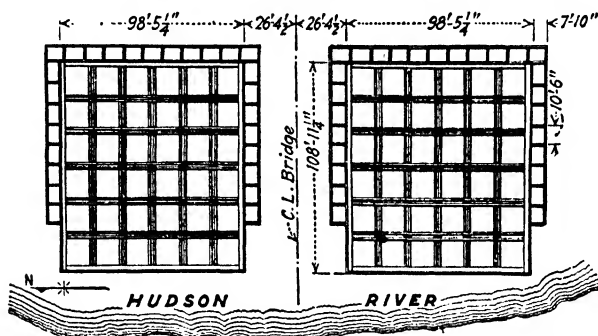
Plan of Twin Cofferdams Used in Building New Jersey Tower Piers of the George Washington Bridge.
